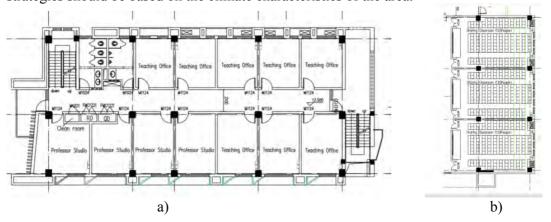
a) Corridor plan in Building D, b) Classroom plan in Building F
